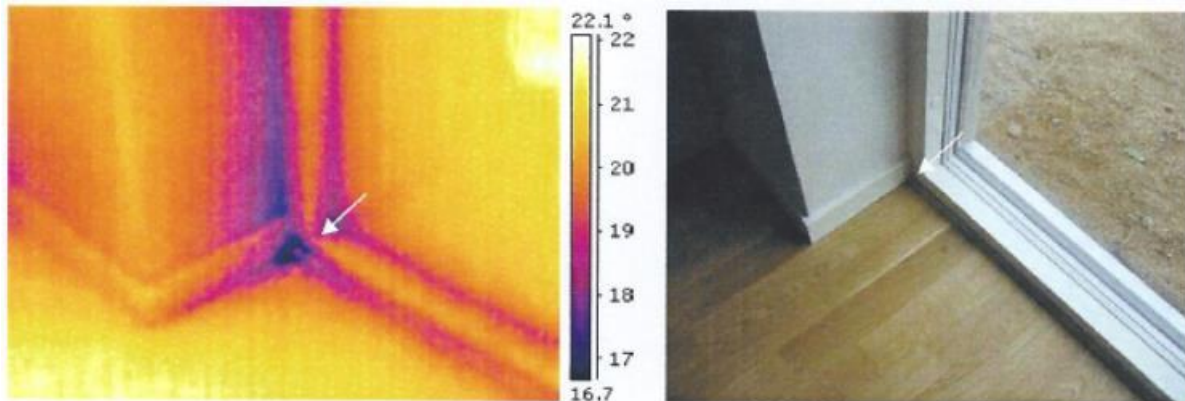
Small leakage between window and corner floor/wall, bottom floor.
